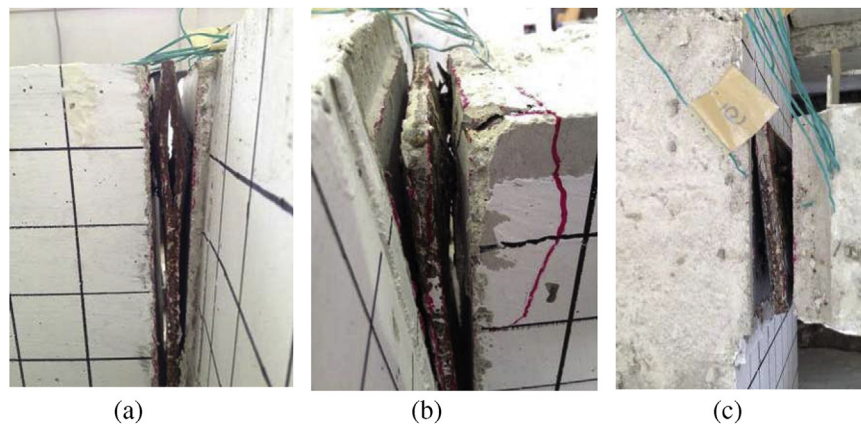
Failure patterns of the welded plate joint: (a) welded plate failure, (b) steel reinforcement yielding, and (c) welding failure at the reinforcement.
